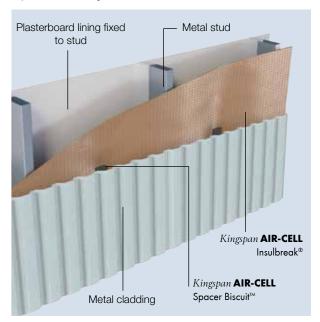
Kingspan AIR-CELL Insulbreak® on steel-framed wall
